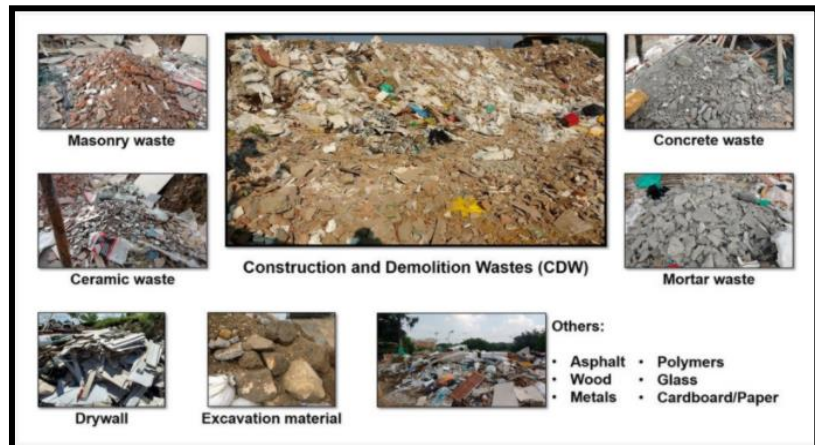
CONSTRUCTION AND DEMOLITION WASTES
